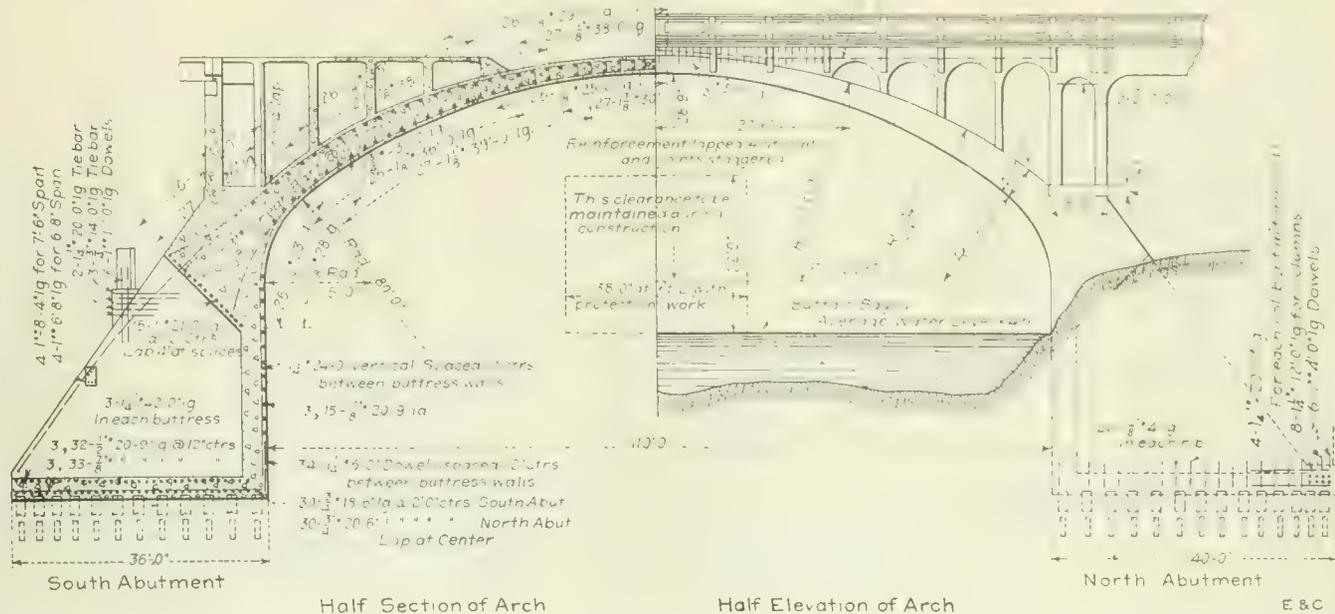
Half Section and Half Elevation of 110-ft. Arch Span of San Jacinto St. Bridge. Note Buttress Type of Abutments and Depth of Footings Below Water Level.
